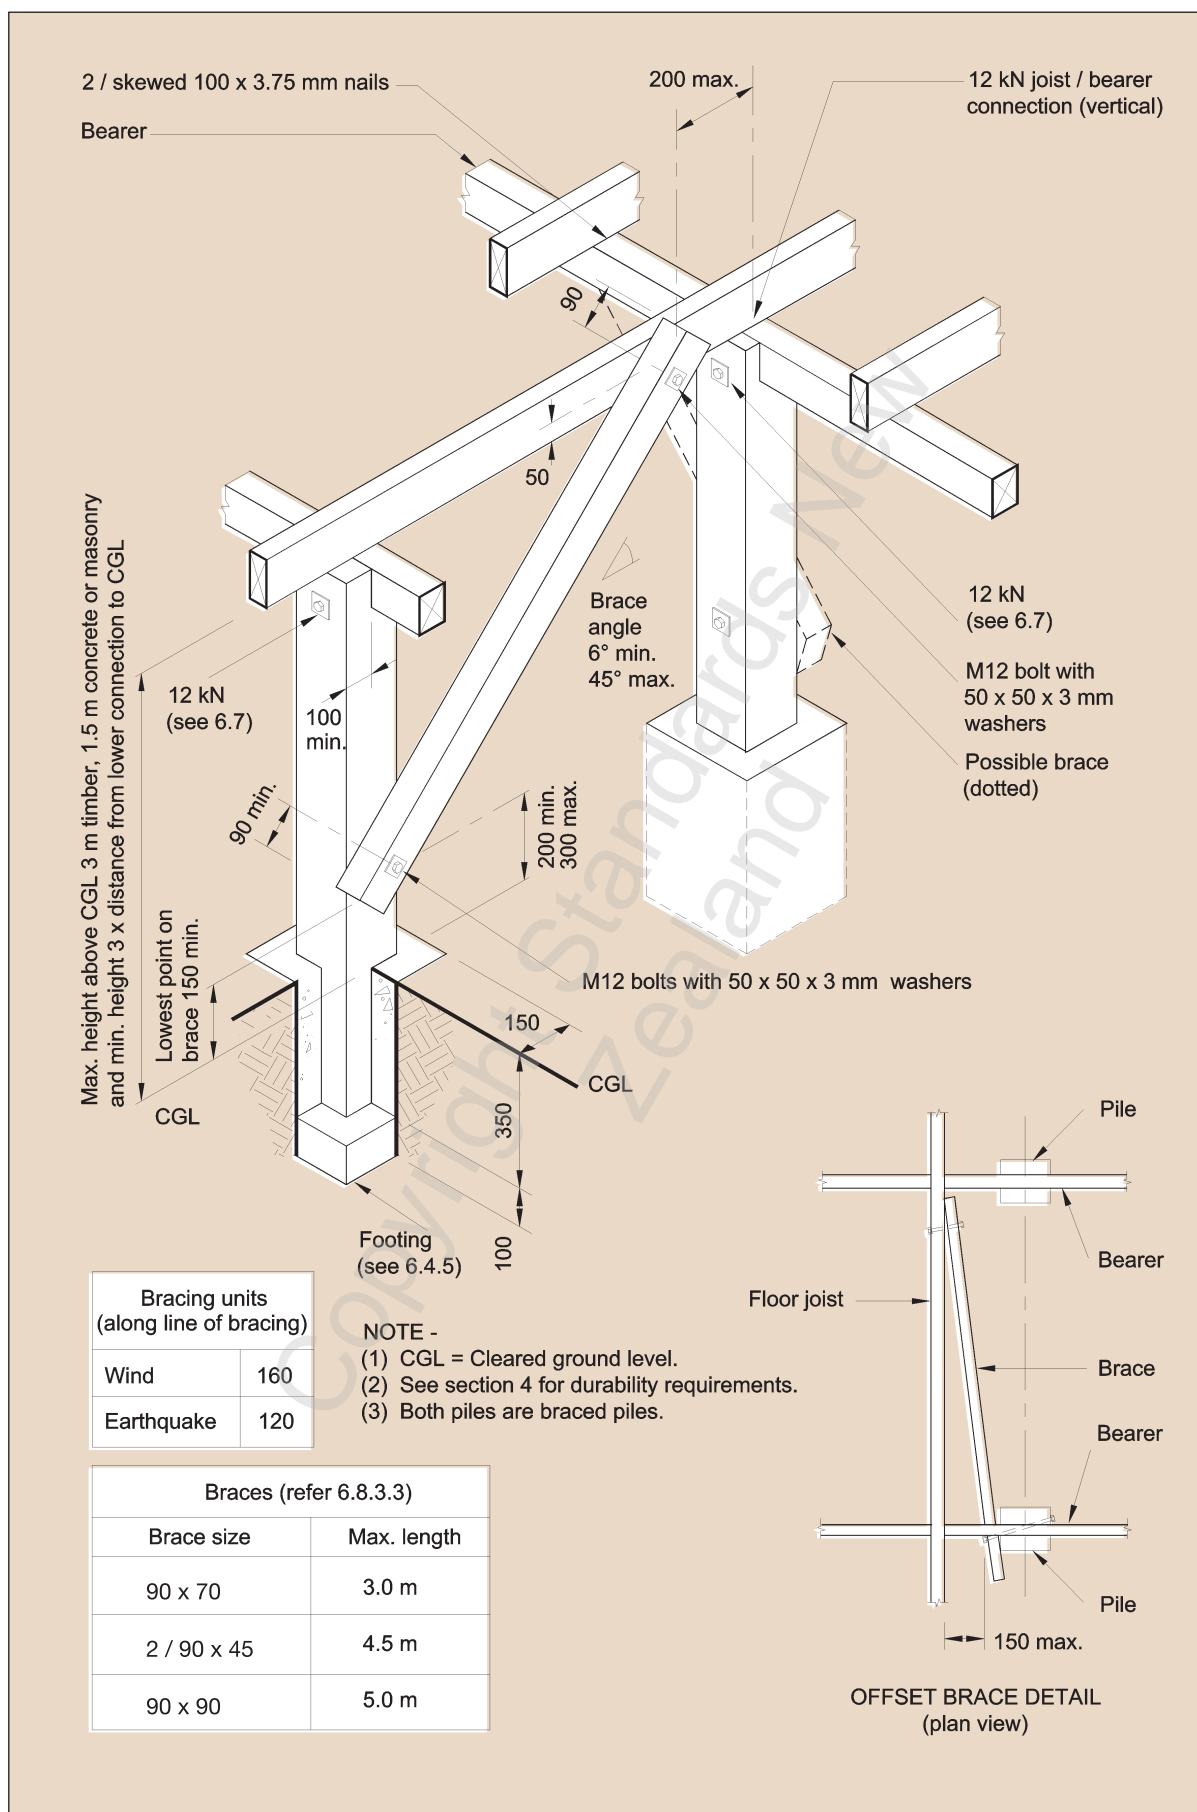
Braced pile system – Brace connected to joist (see 6.8)
